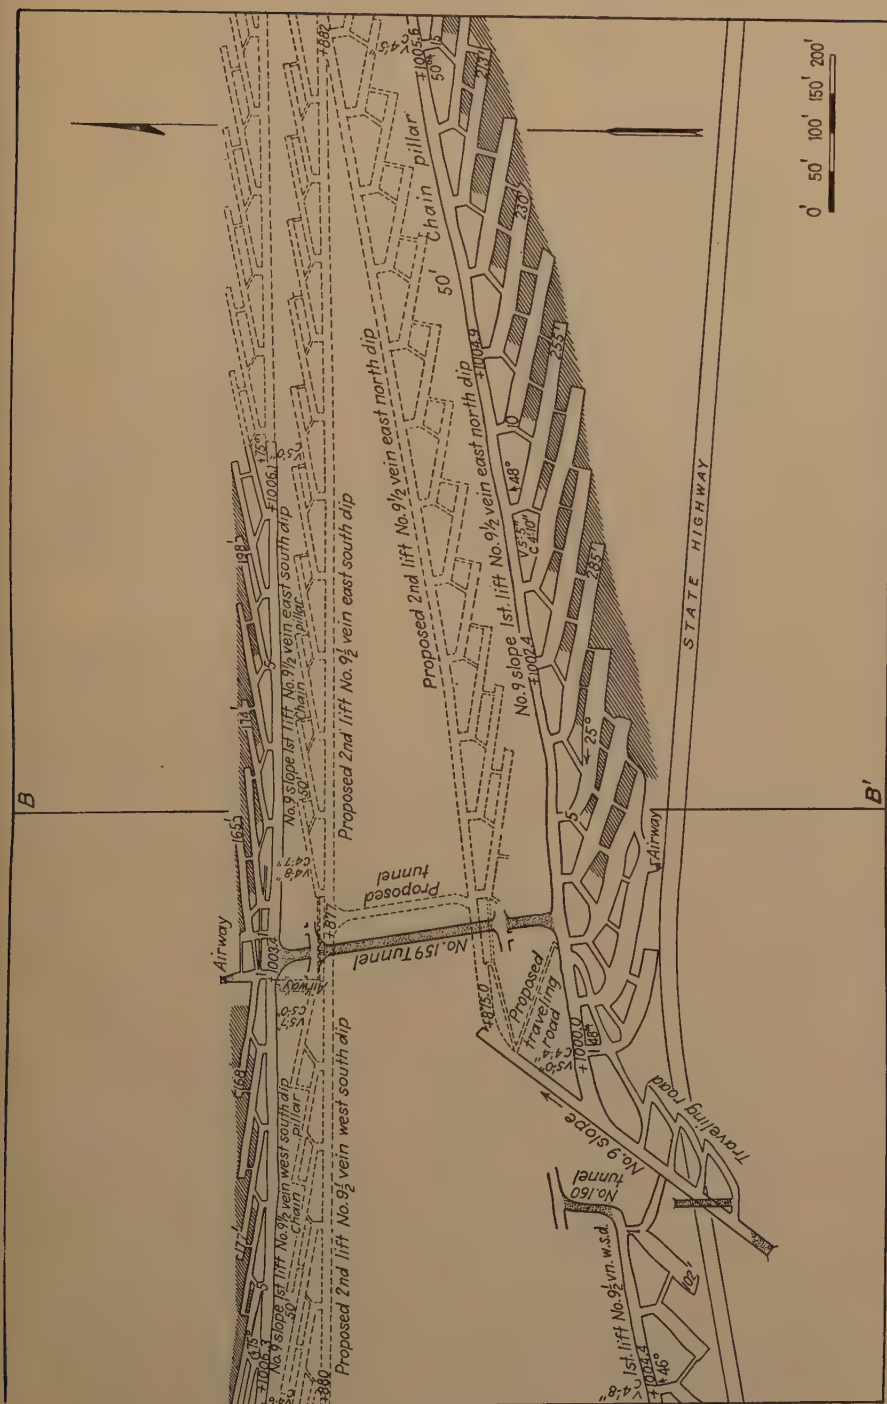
MINING METHOD AND PROPOSED DEVELOPMENT No. 9½ SEAM, HICKORY RIDGE SECTION.
